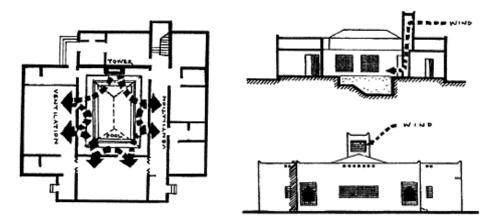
Plan and sections of the study house showing the role of the cooling tower in ventilating the courtyard (Al-Hemiddi and Al-Saud 2006)
